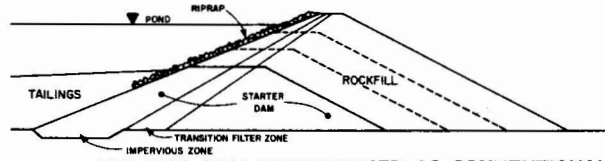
TAILINGS DAM CONSTRUCTED AS CONVENTIONAL WATER STORAGE DAM
